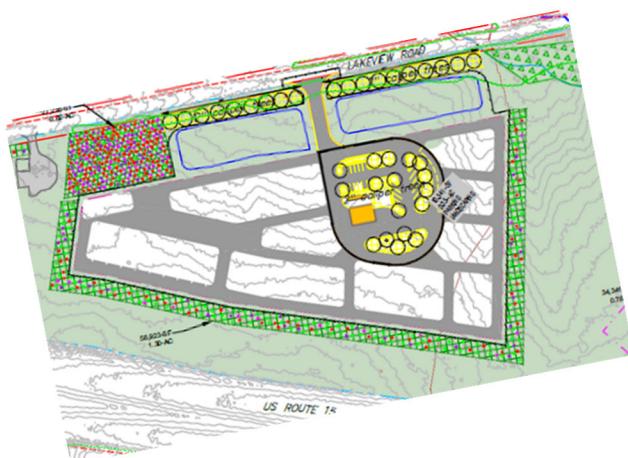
Excerpt from Attachment 4 (2025 Site Plan Landscaping Plan).
